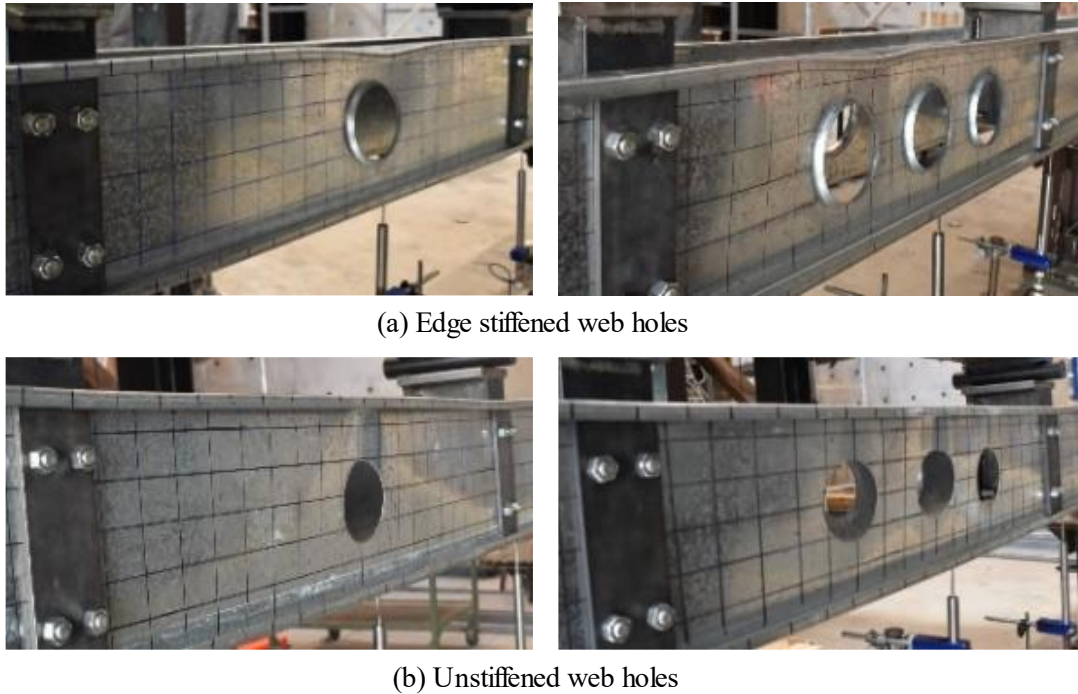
Failure modes of CFS channel beams with holes under bending [8].
